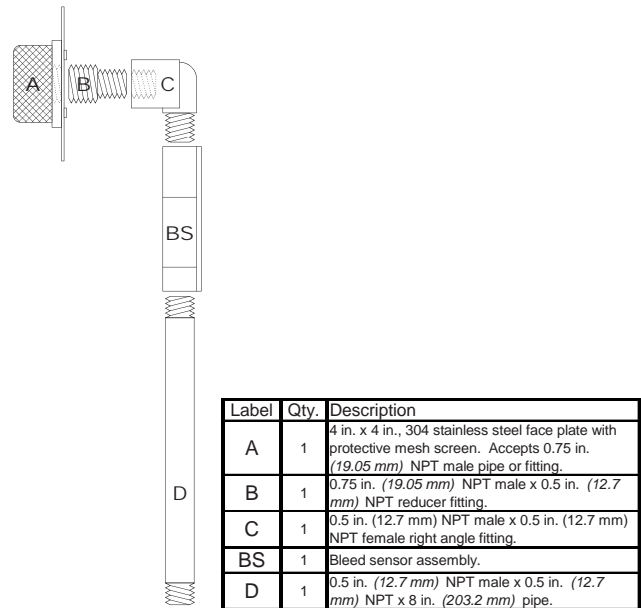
HB1/SB1 Underfloor Wall Mount Detail View
